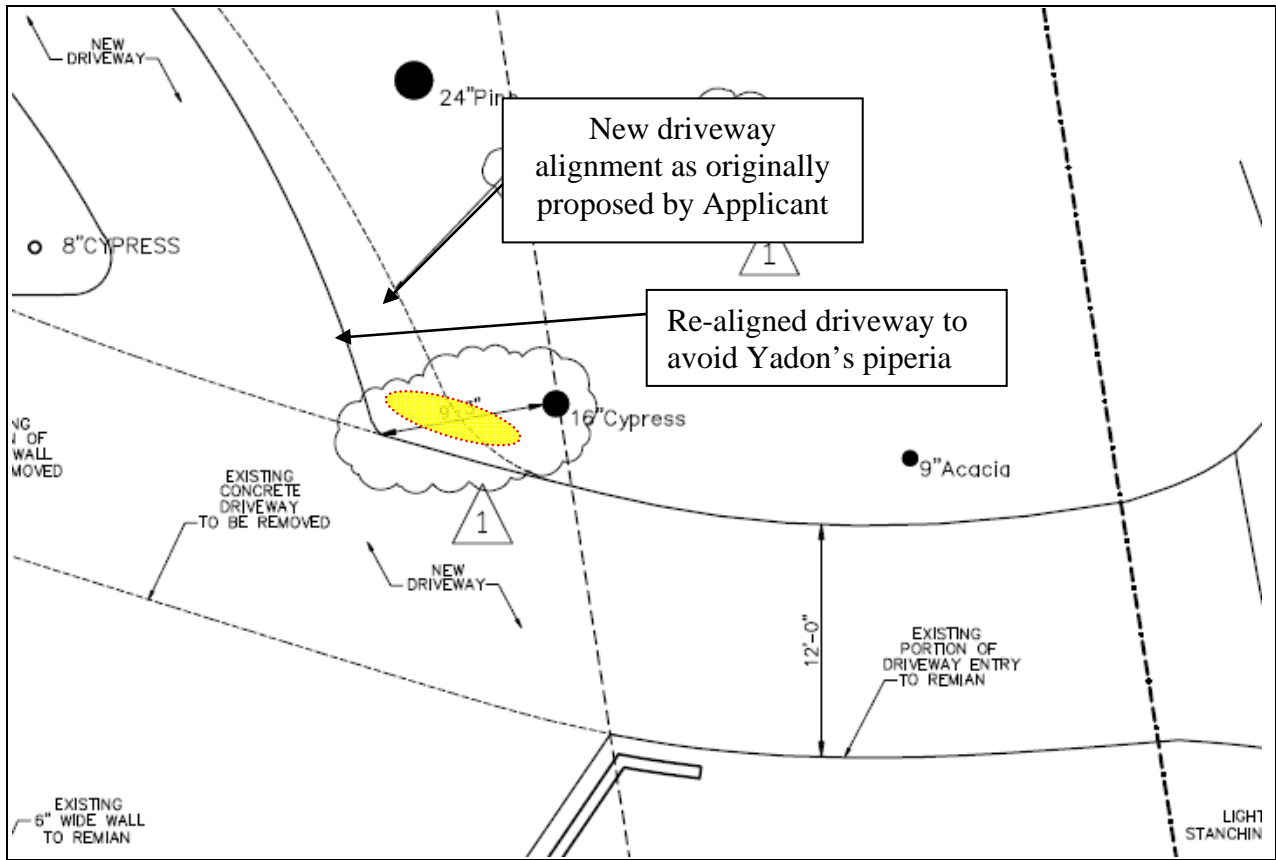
Close up view of Proposed Site Plan with revisions to driveway
